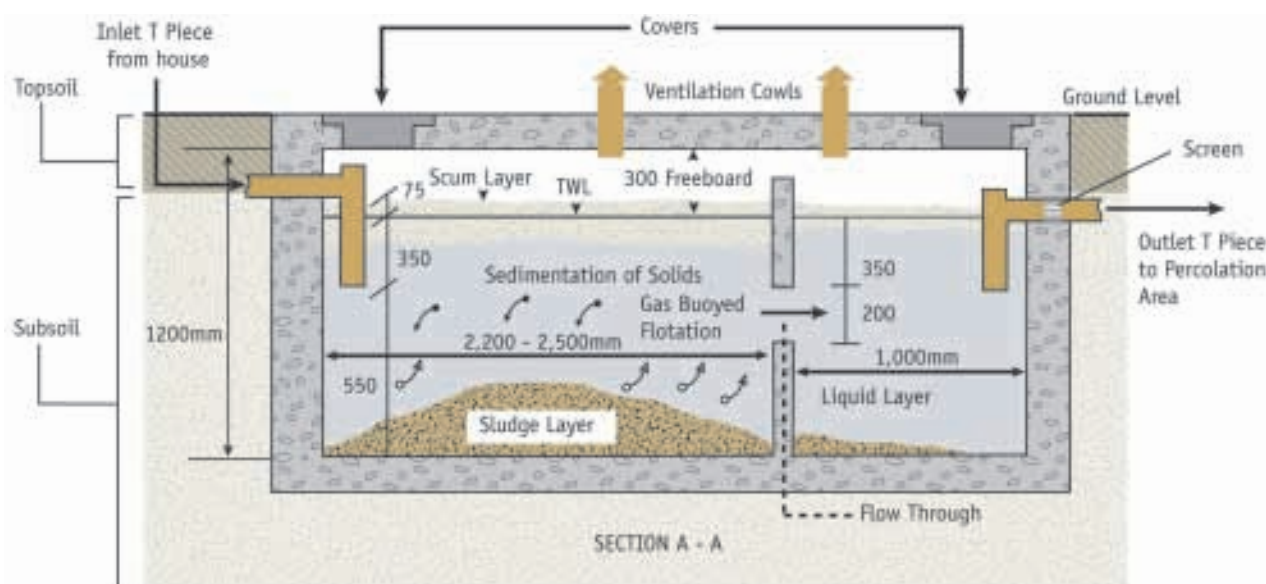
LONGITUDINAL SECTION OF A TYPICAL SEPTIC TANK (ALL DIMENSIONS IN MM).
